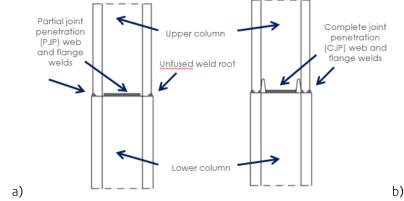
Typical CJP column splice construction details.: a) Pre-Northridge earthquake b) Post-Northridge earthquake.
